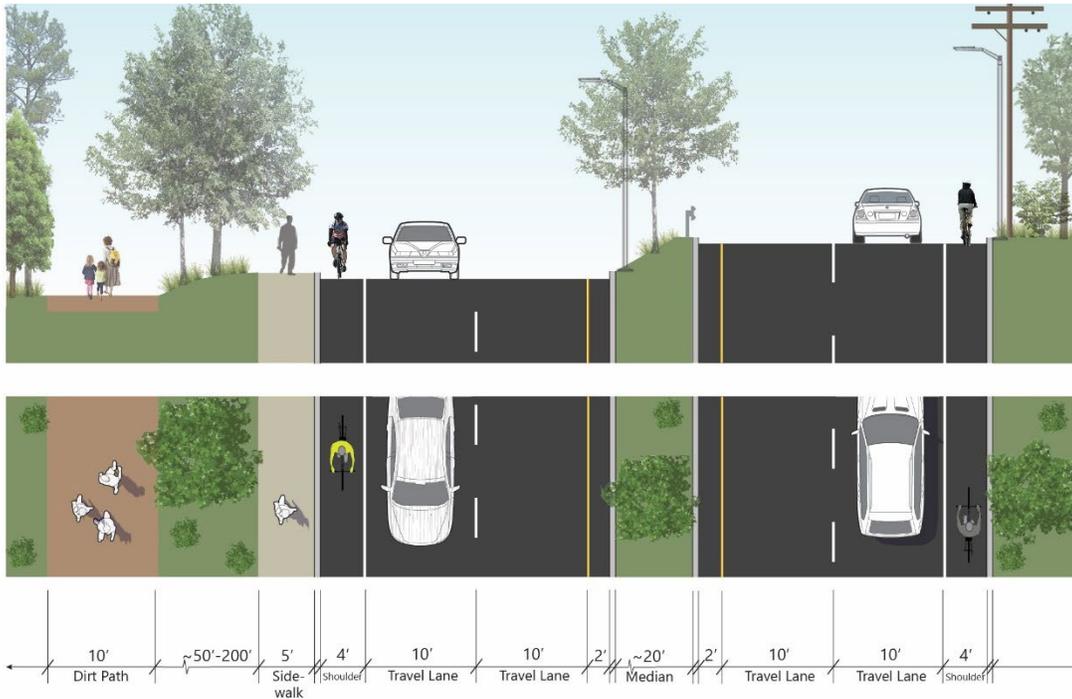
Section C-2: Proposed Woodland Road, facing north (DRAFT CONCEPT)
